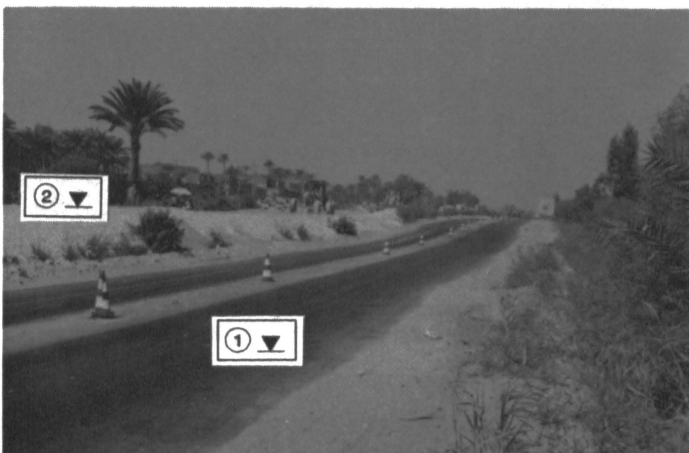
Liquefaction induced settlement at Upper Egypt Road West of the Nile: 1) road elevation after earthquake (2 right lanes); 2) original road elevation being restored during repair (2 left lanes).
